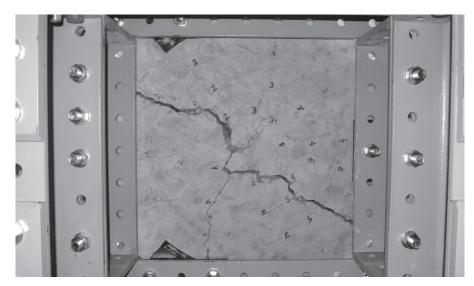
Plate without reinforcement (M0) after firs impact, bottom view Rys. 5.5. Płyta bez zbrojenia (M0) po pierwszym uderzeniu, widok z dołu
